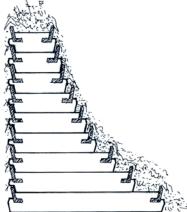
Noise protection embankment from soil, on both sides stabilised/boarded with elements/products made from cement concrete
